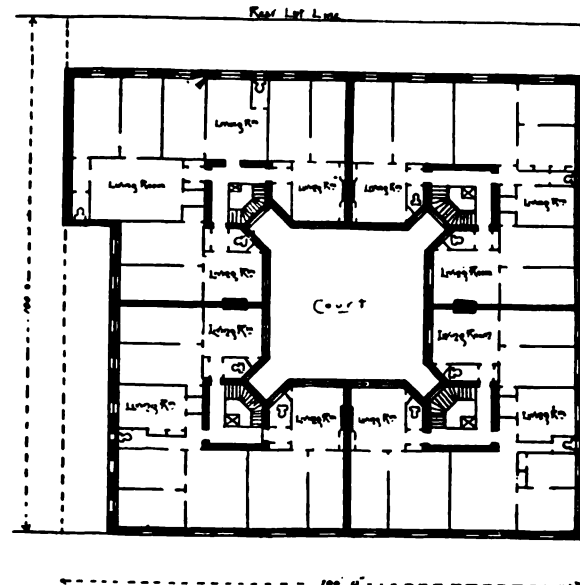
PLAN OF TENEMENTS IN NEW YORK. MR. ERNEST FLAGG, ARCHITECT.
